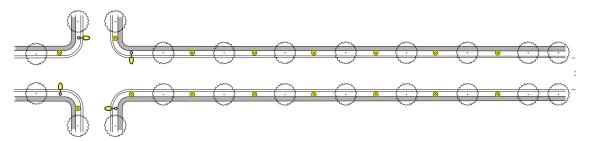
Typical Local Street with Continuous Pedestrian Lighting Plan
